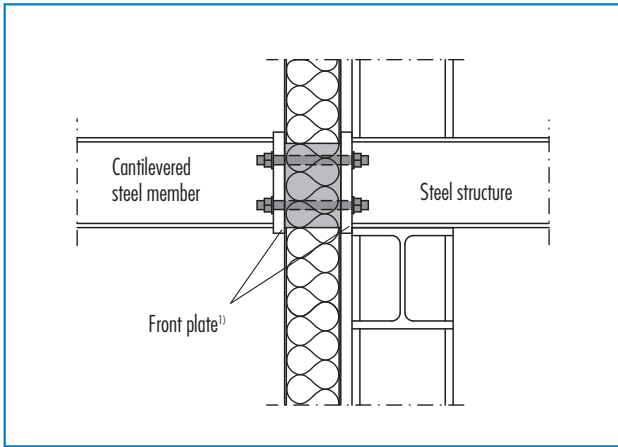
Schöck Isokorb® type KST for free cantilevered steel structures
